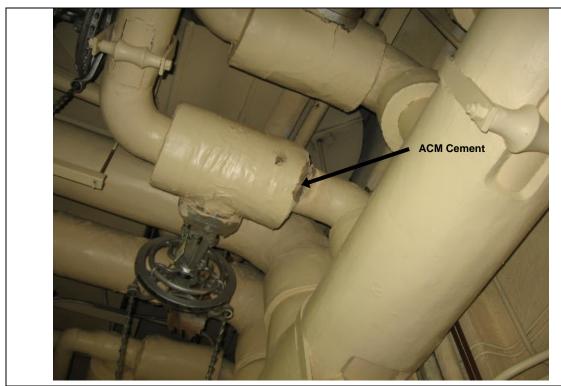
ACM cement on end of fiberglass pipe wrap in Room No. 1-10 (Sample No. ACM 30).
